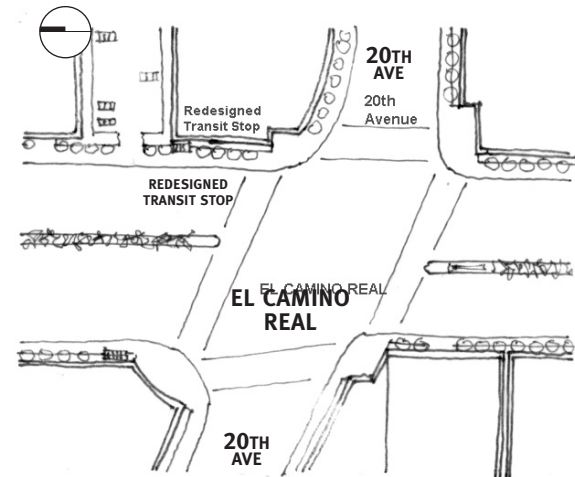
Potential private redevelopment at the 20th Avenue intersection, including additional sidewalk width, landscape setbacks, expanded corner plazas and redesigned transit stops.
